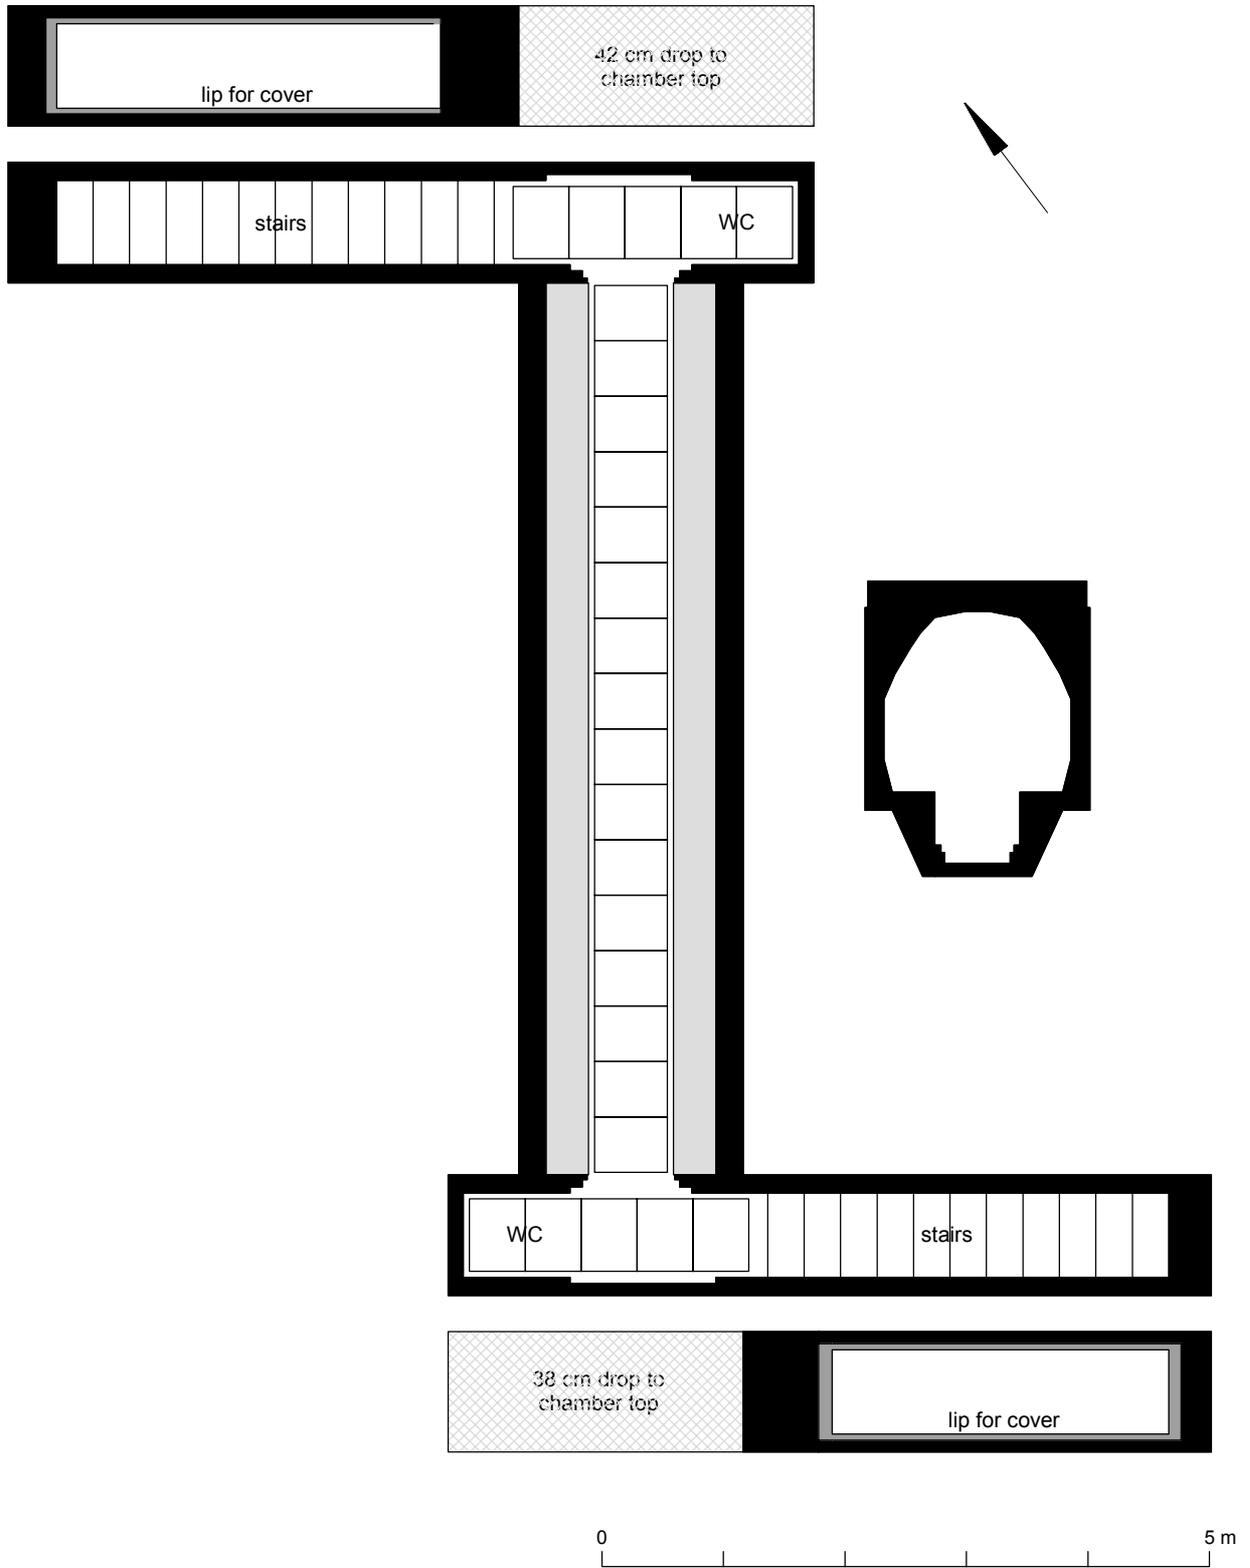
Area J1, air-raid shelter F2: internal plan and cross-section of chamber.
